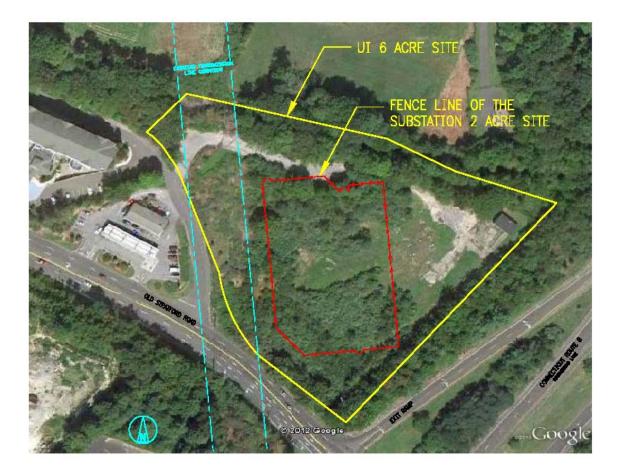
Aerial Photograph of UI Property and Substation Site at 14 Old Stratford Road
